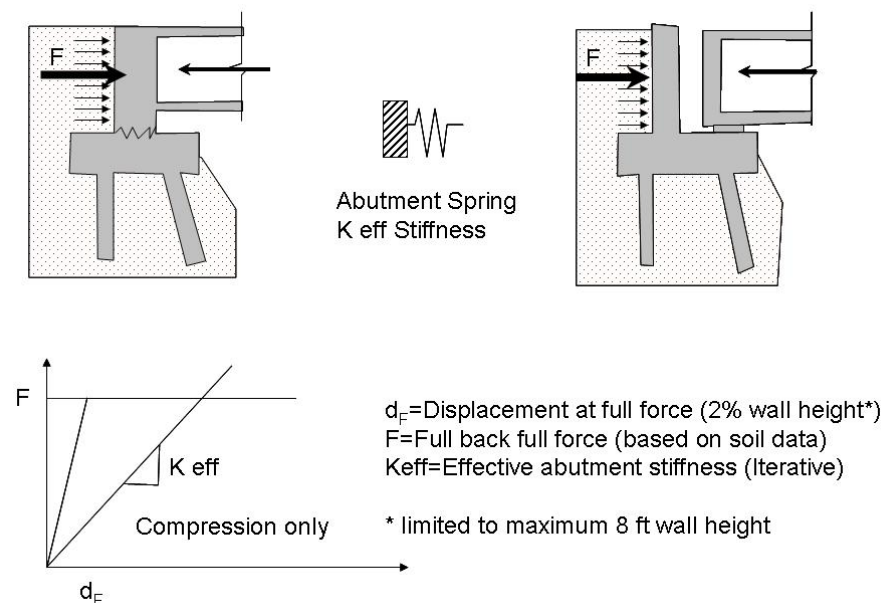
a - Abutment Passive Soil Stiffness Modeling
